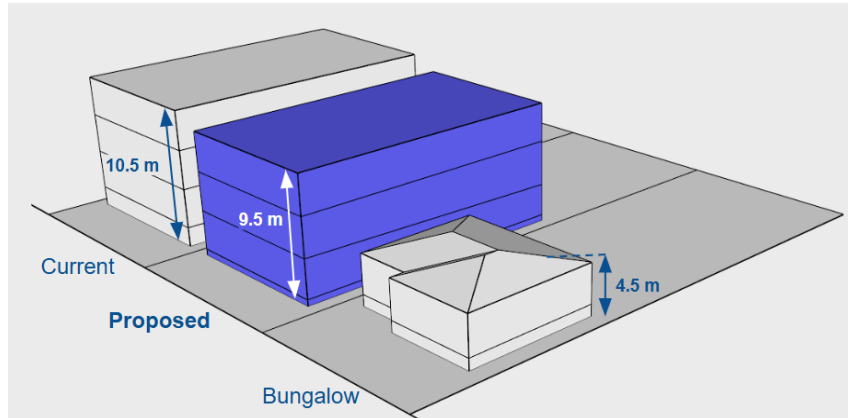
Perspective - Pitch Roof Maximum Height 9.5 m
